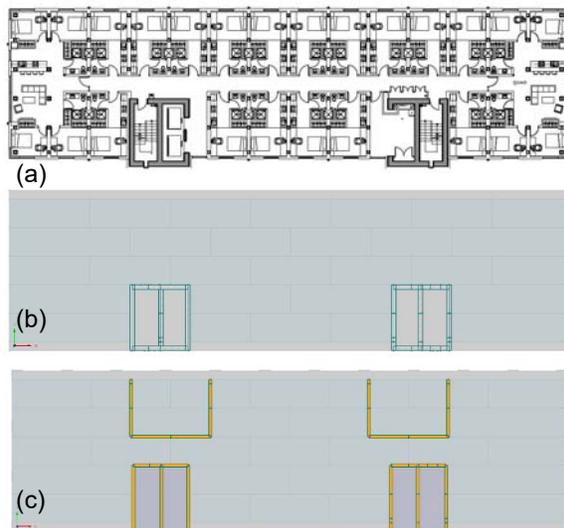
Floor plan of UBC TWB (a); cores for numerical models for designs D2 and D3 (b) and design D4 (c)
